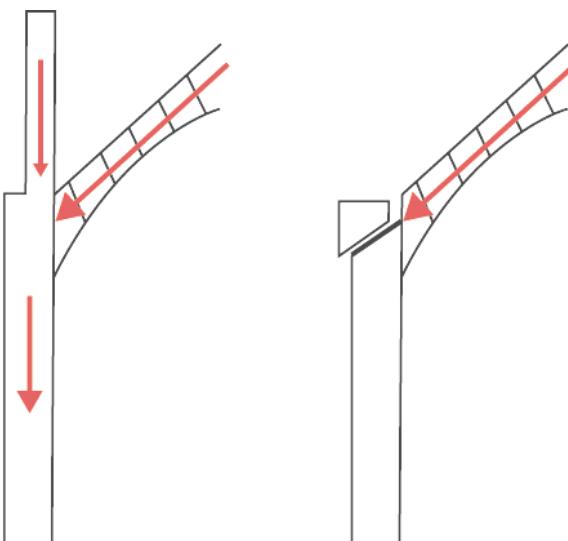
Pinnacle prevents sliding failure due to lateral forces exerted on a buttressing pier
